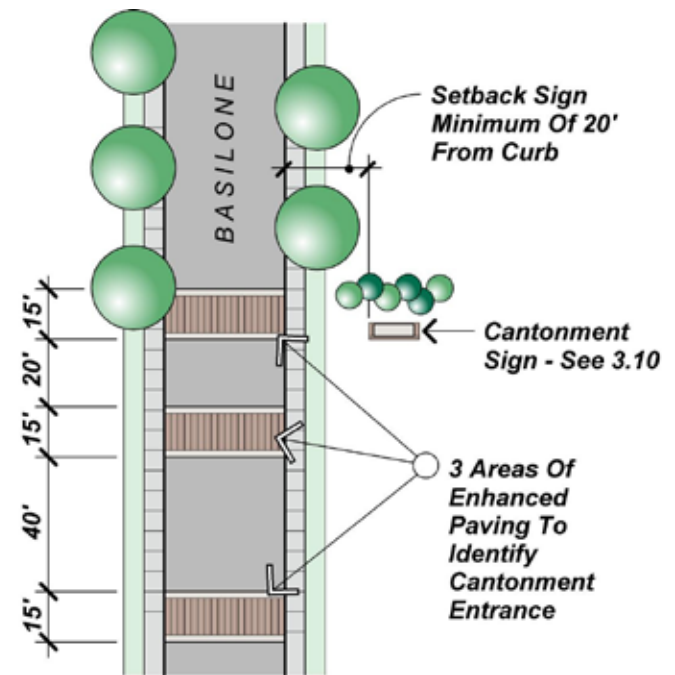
Typical paving treatment prior to cantonment entrance.
